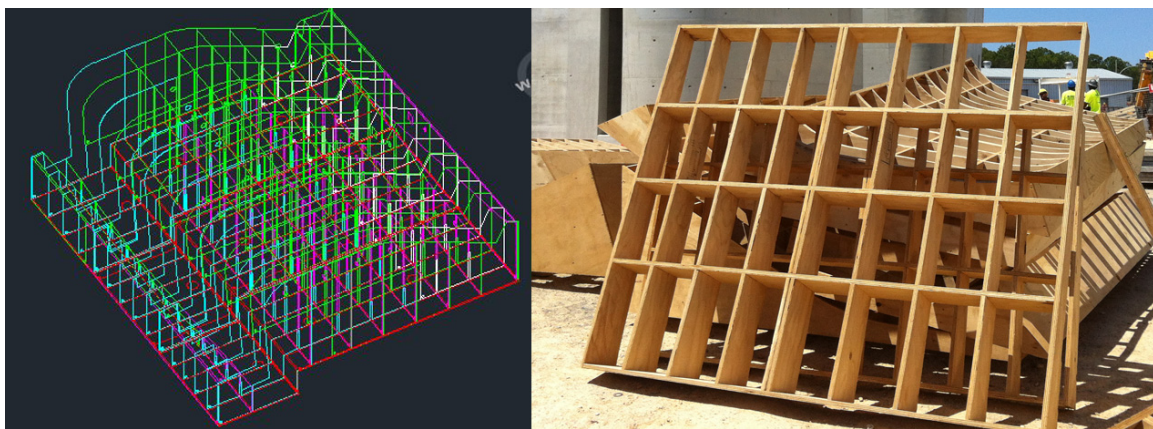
3d formwork shop drawing model (PERI) (left) and formwork frame (right) (photo by author).
